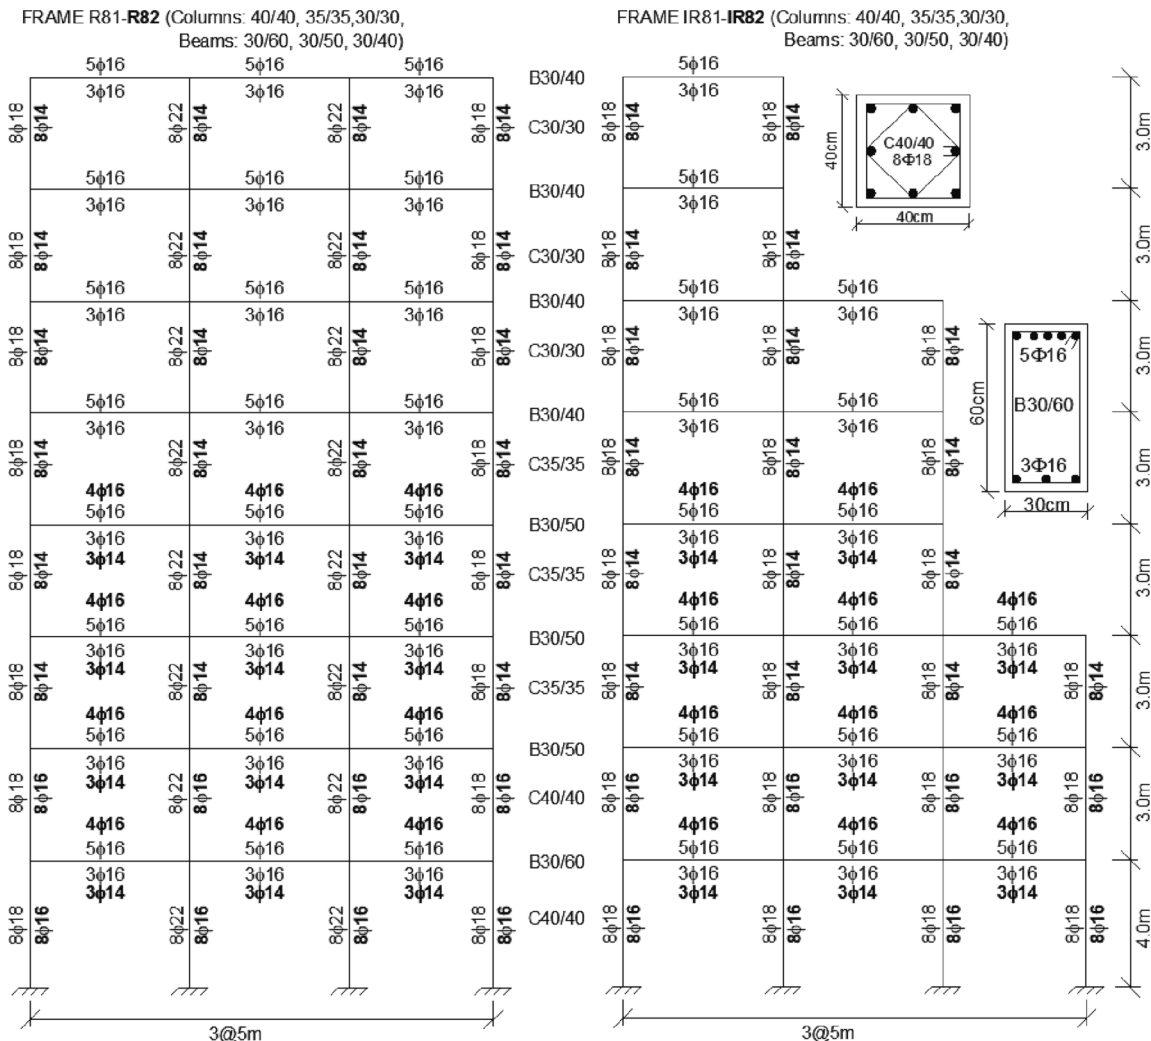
Geometrical and reinforcement details of R8 and IR8 frames.
